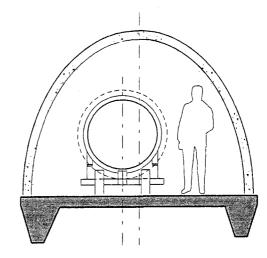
Beam Tube Enclosure Cross Section
